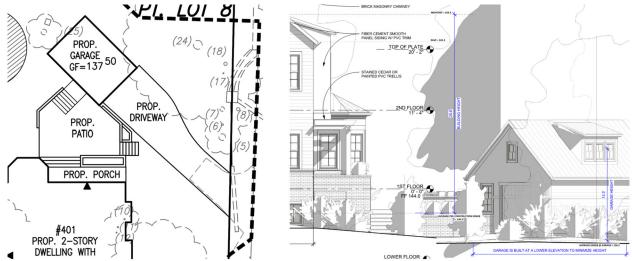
Proposed Free-standing Garage with Patio Connection to Main Structure
